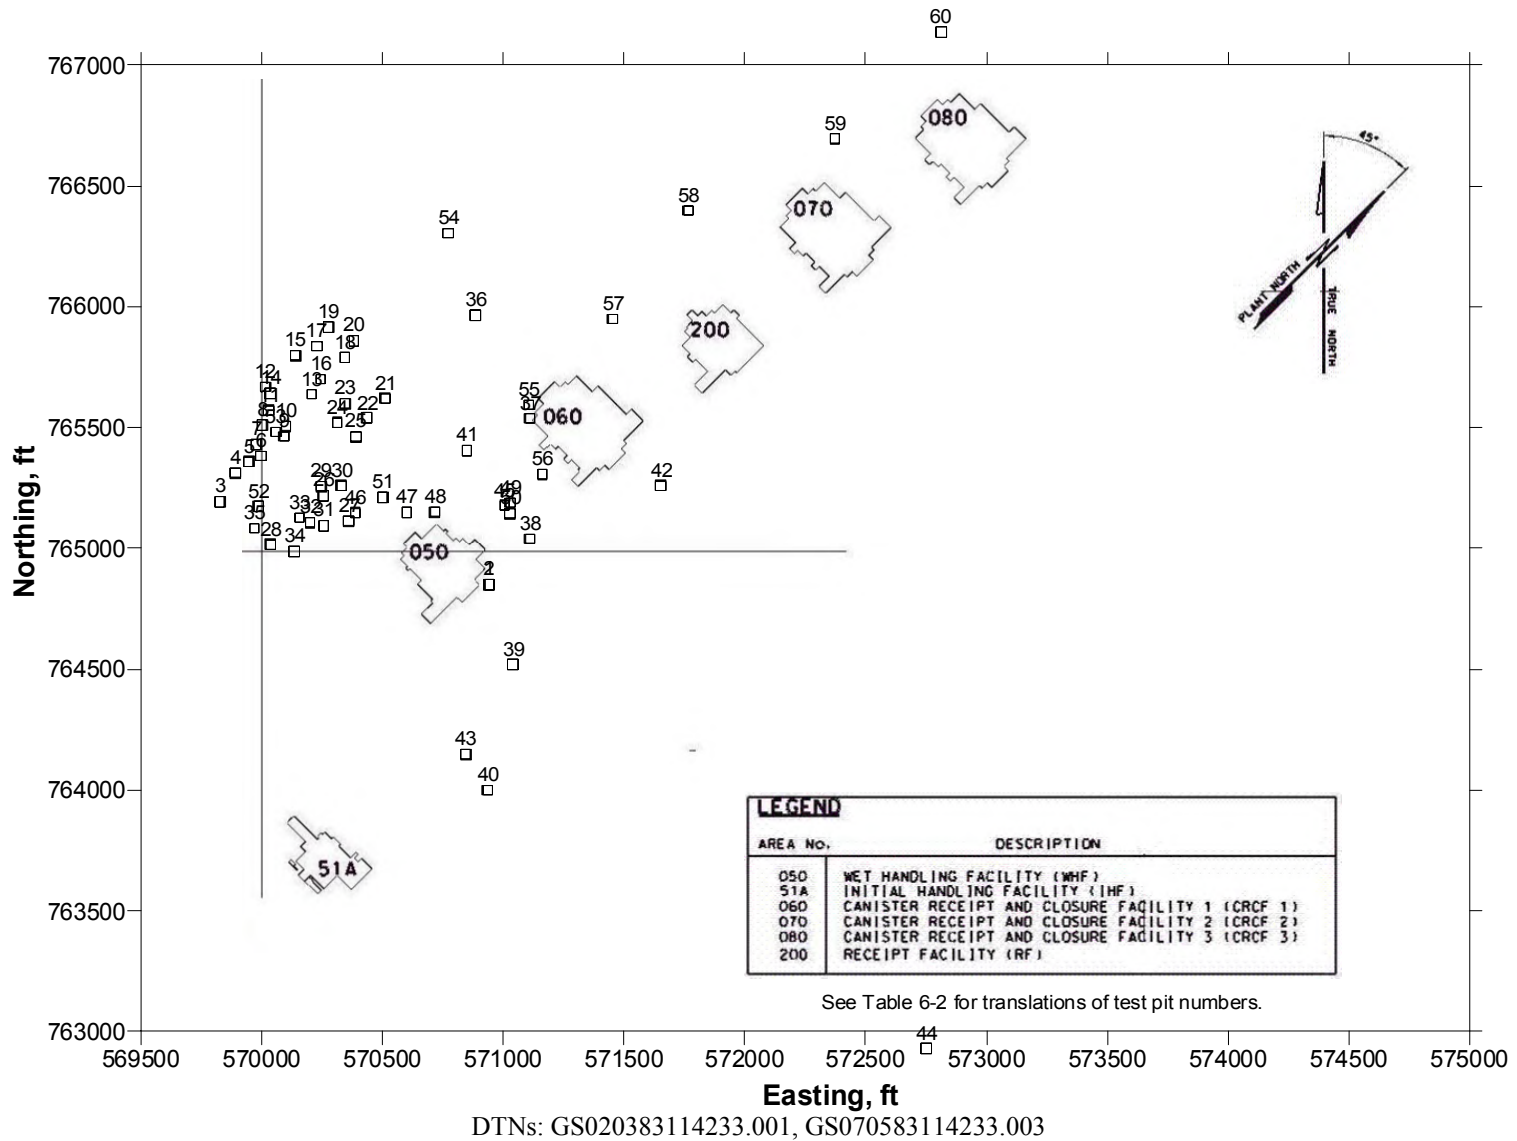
Locations of Test Pits in Surface Facilities Area with respect to Building Footprints.
